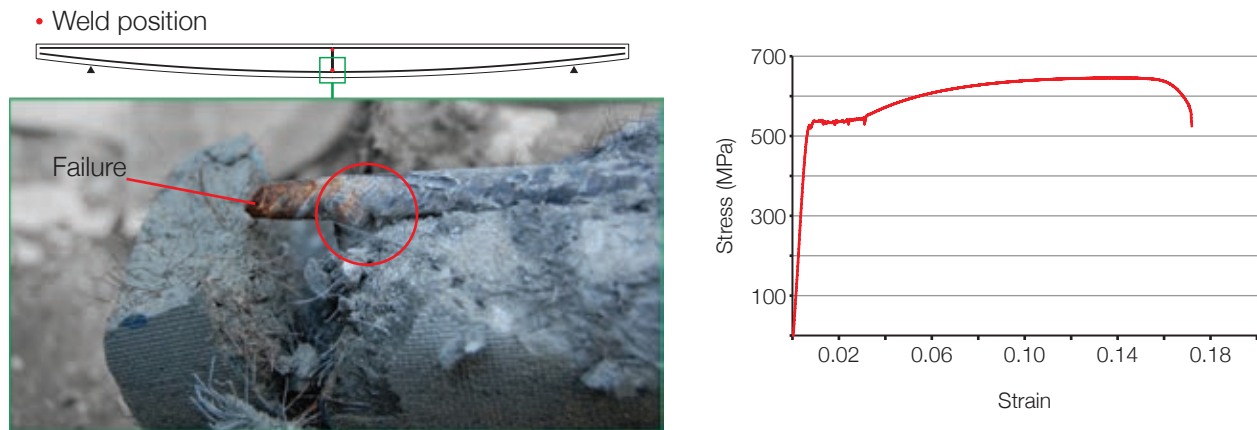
Failure location (l) and steel properties (r) in Beam 7\_5 tested on coupon extracted from the failed beam at the quarter span.
